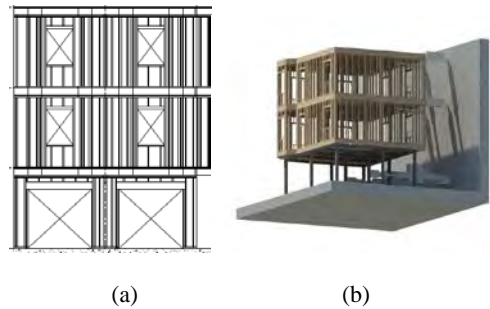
NEES-Soft project retrofit building to be tested at NEES@Buffalo and used as the illustrative example in this paper; (a) Elevation view showing soft-story; (b) Solid model of full-scale experimental setup with first story numerically reproduced during hybrid experiment.
